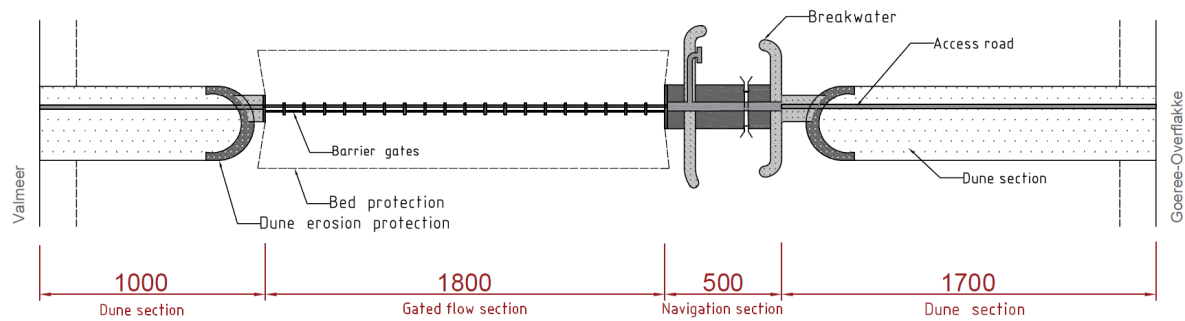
Spatial design for the New Haringvliet barrier. The dune sections are connected to the structural barrier elements by short breakwater sections. The navigation section is a shipping lock sheltered by breakwaters.
